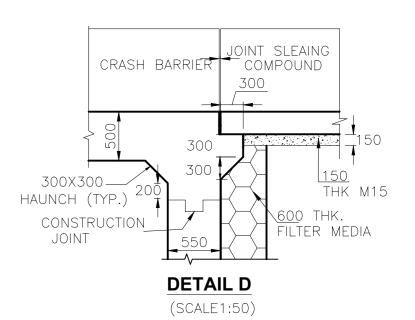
DETAIL OF CURTAIN WALL-II (UP STREAM SIDE)
